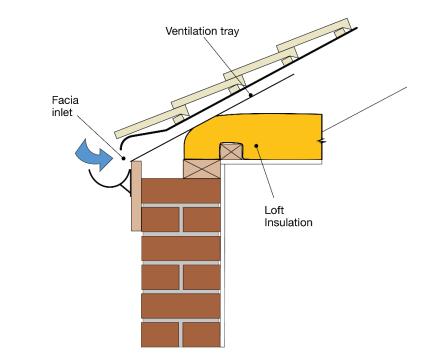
Standard Eaves Detail on a solid wall construction without external wall insulation (EWI)
